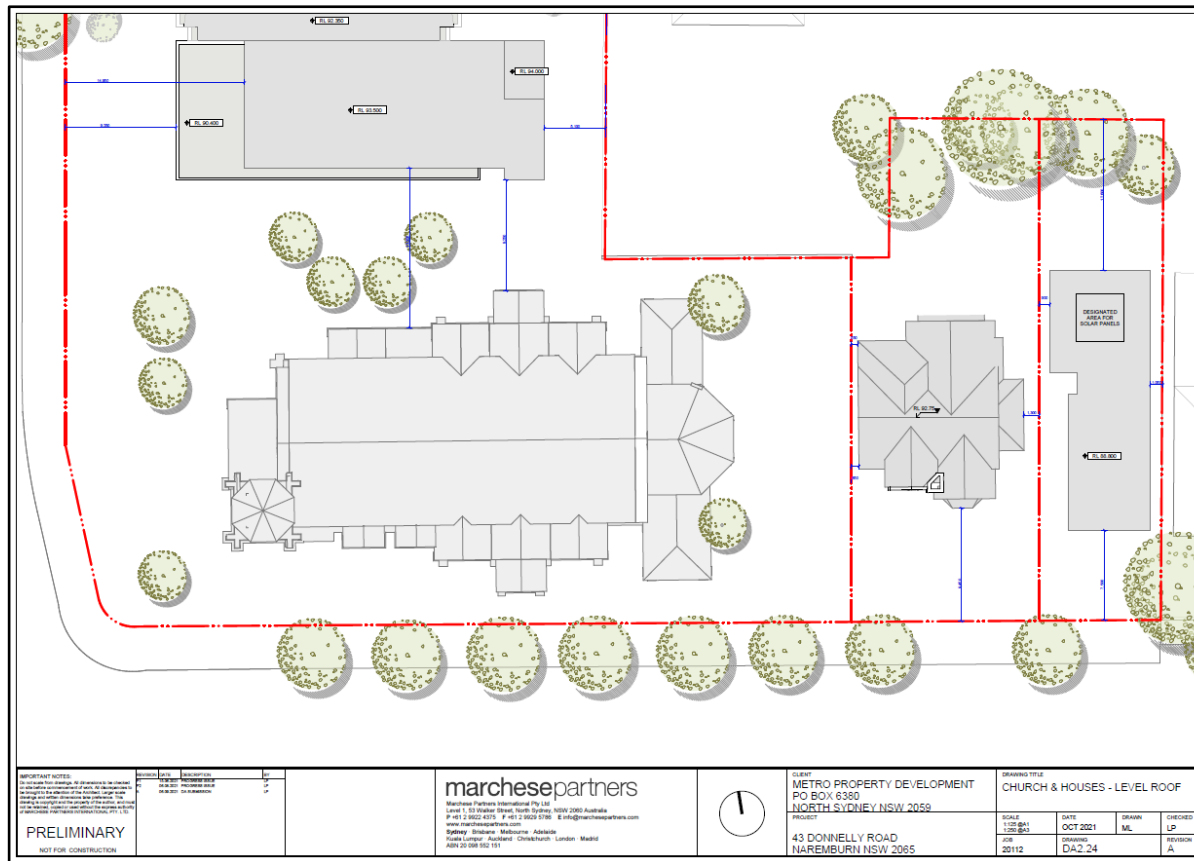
Proposed roof plan of the church, existing presbytery and the new dwelling.
